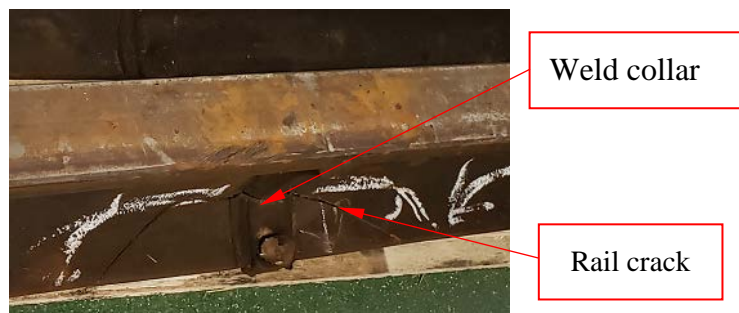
Wheel flange mark on the weld collar of a cracked rail
